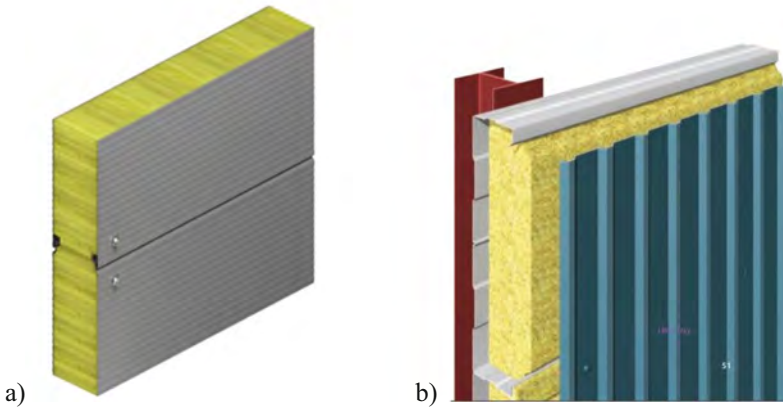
Typical wall sandwich panel (a) and liner tray wall system (b) [14].
